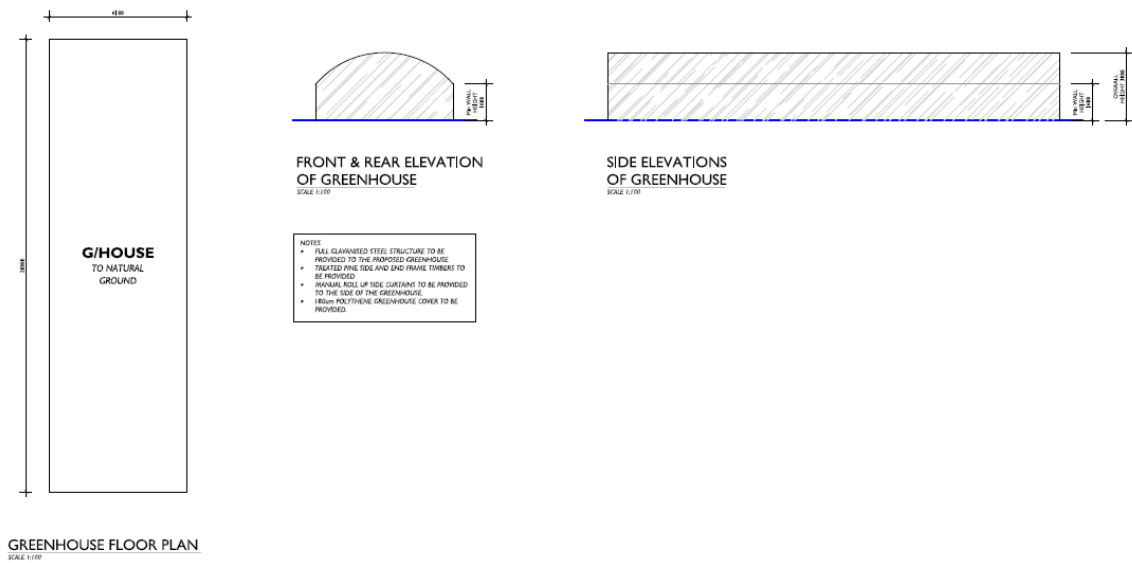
Greenhouse Floorplans and Elevations Extract Jackson and Fapio Pty Ltd
